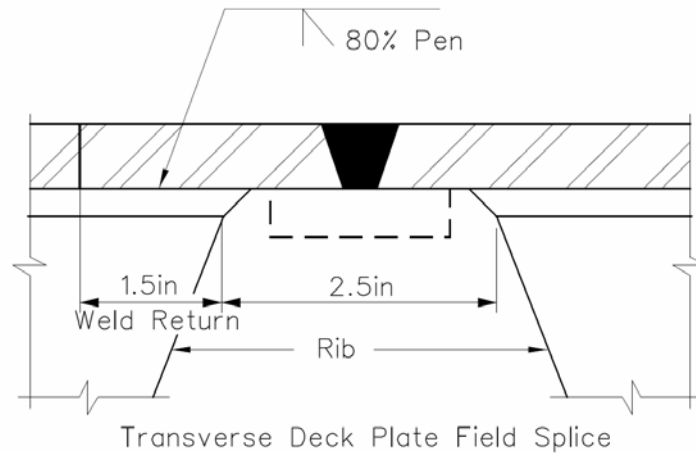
Bolted Rib Splice and CJP Deck Splice with the Backing Bar Removed showing the rib sealing plates. The Rib has been Cut Back to Provide Sufficient Access
